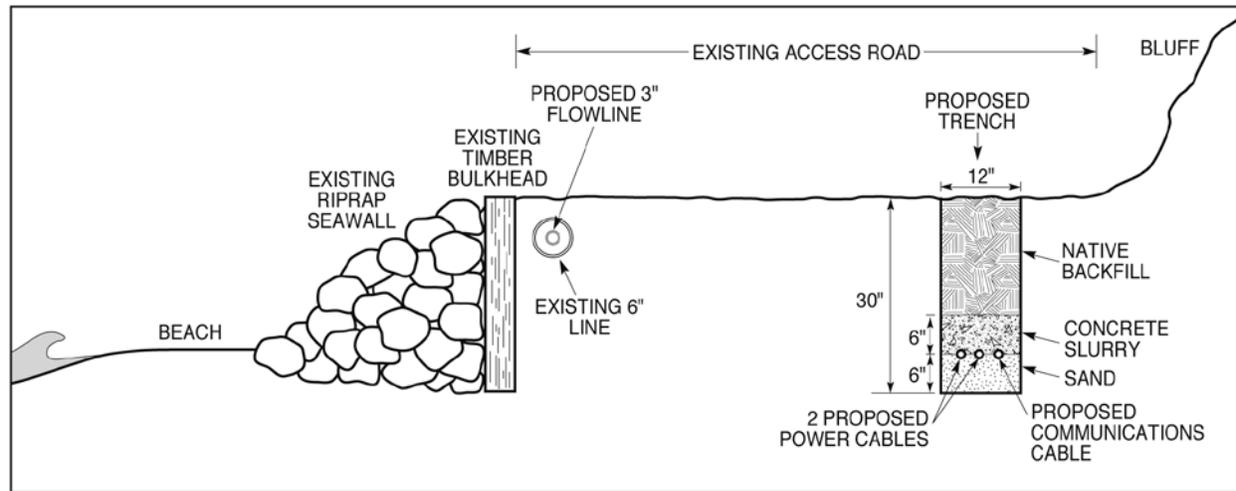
Existing Access Road and Proposed Pipeline and Power Cable Corridor
